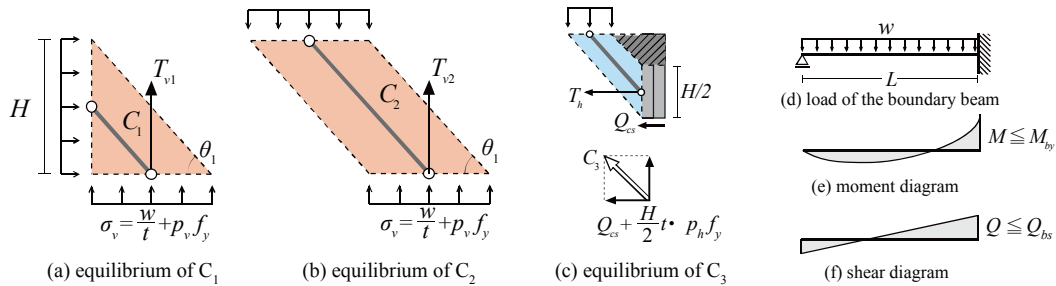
Equilibrium of compression struts and load of the boundary beam
